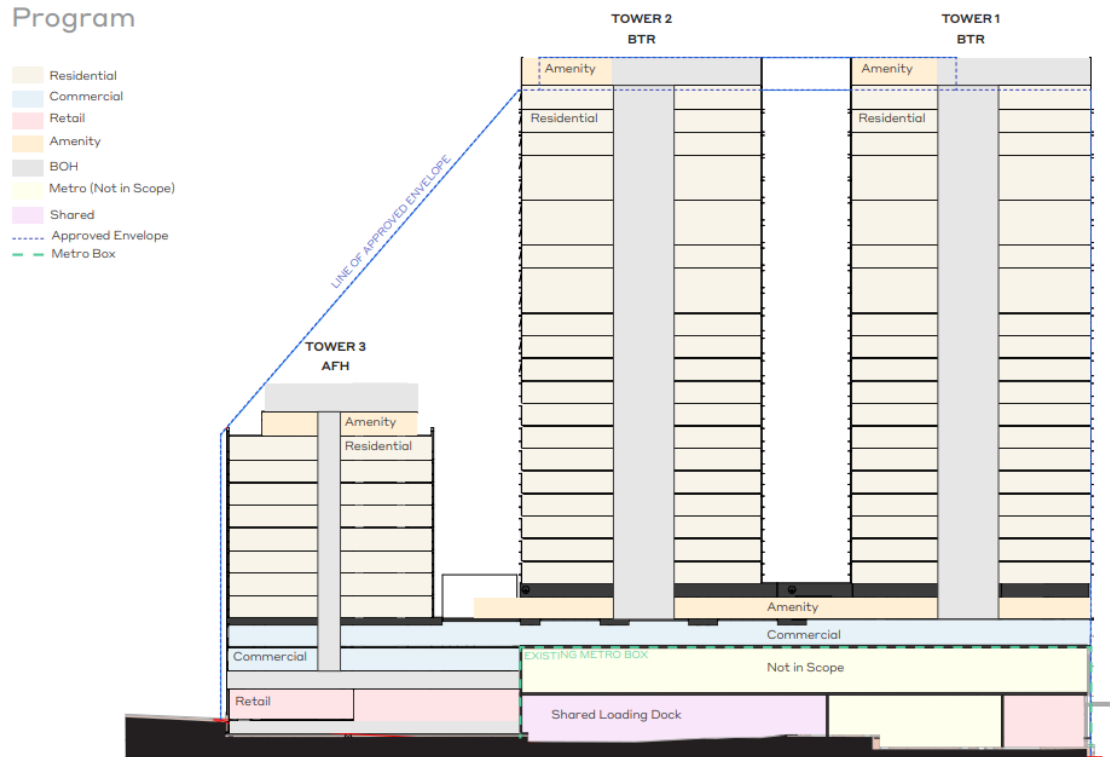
Crows Nest OSD Site A (Source: Woods Bagot, Major Projects Portal)
